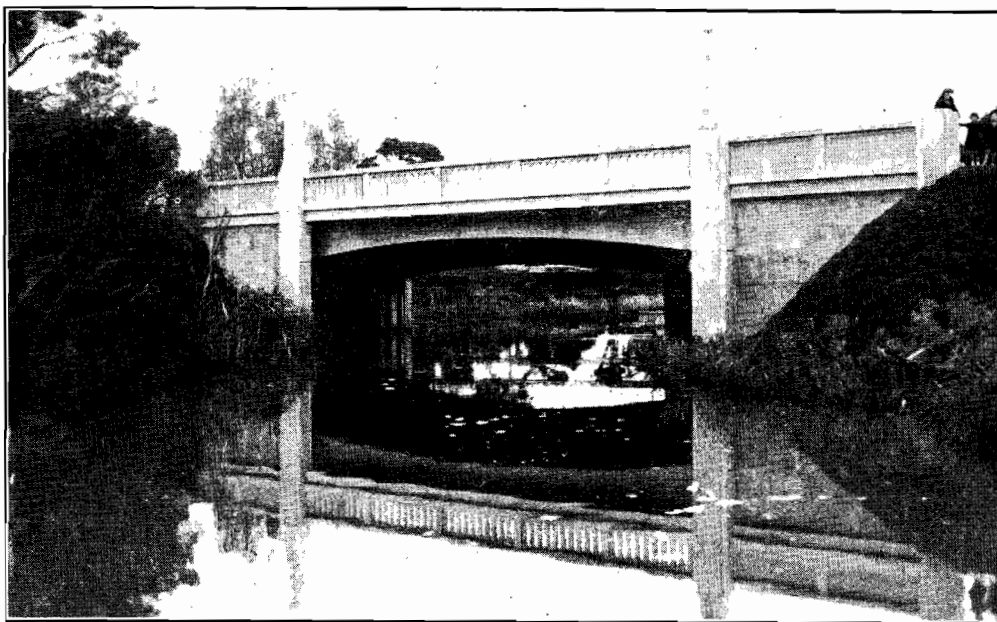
Showing concrete bridge erected over the Kananook Creek on the Point Nepean Road at Frankston.
